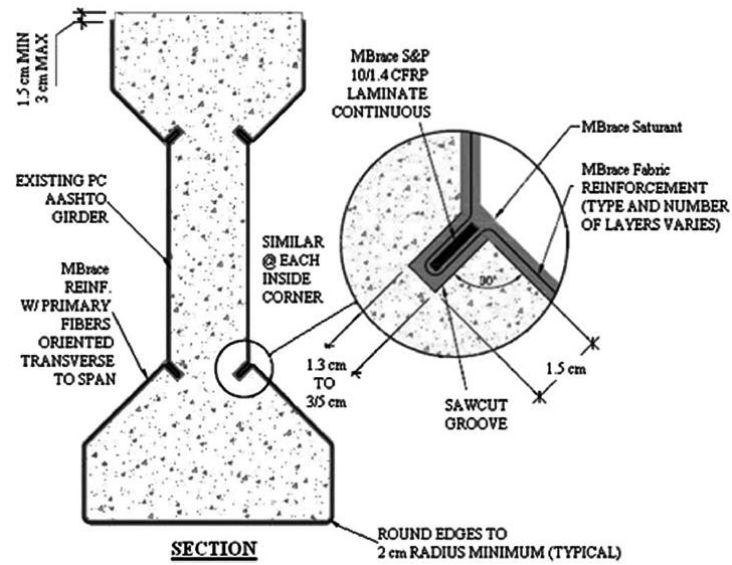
Embedded CFRP Laminate Anchorage System Detail (from Petty et. al 2011)
